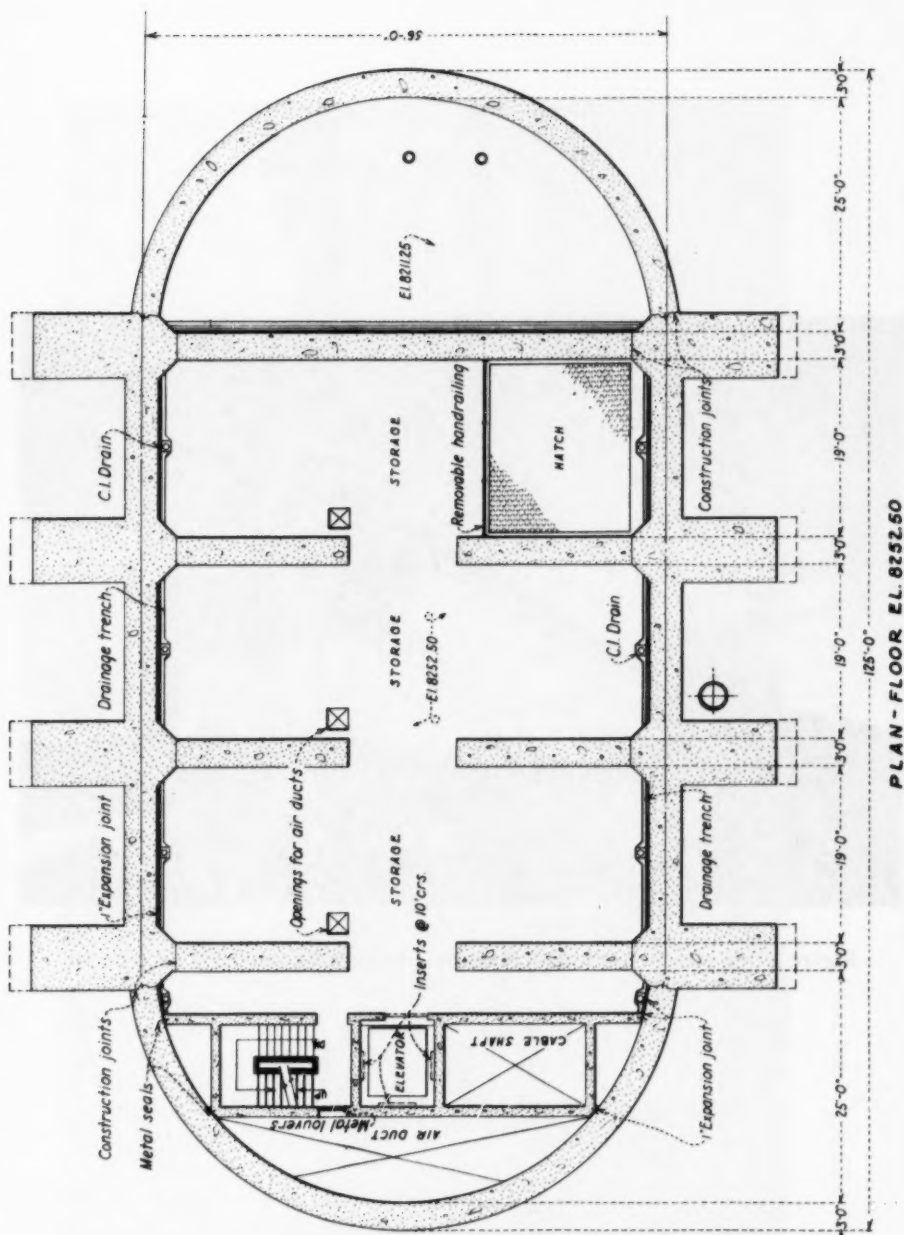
Watertightness was a prime requisite in construction. Only four vertical construction joints were provided in the exterior walls; they were between the arch rings and rectangular section. Metal seals were provided for these joints.
